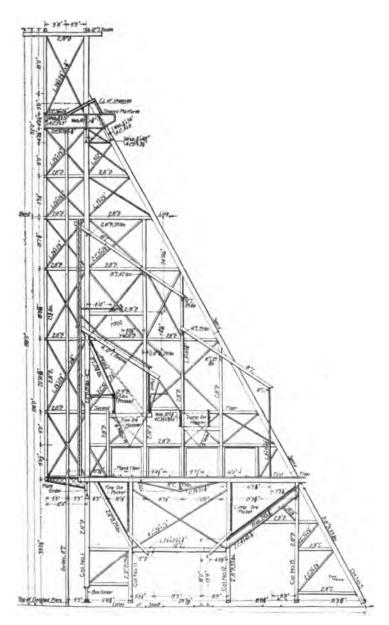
Steel Shaft House for Sibley Mine, Side Elevation.
